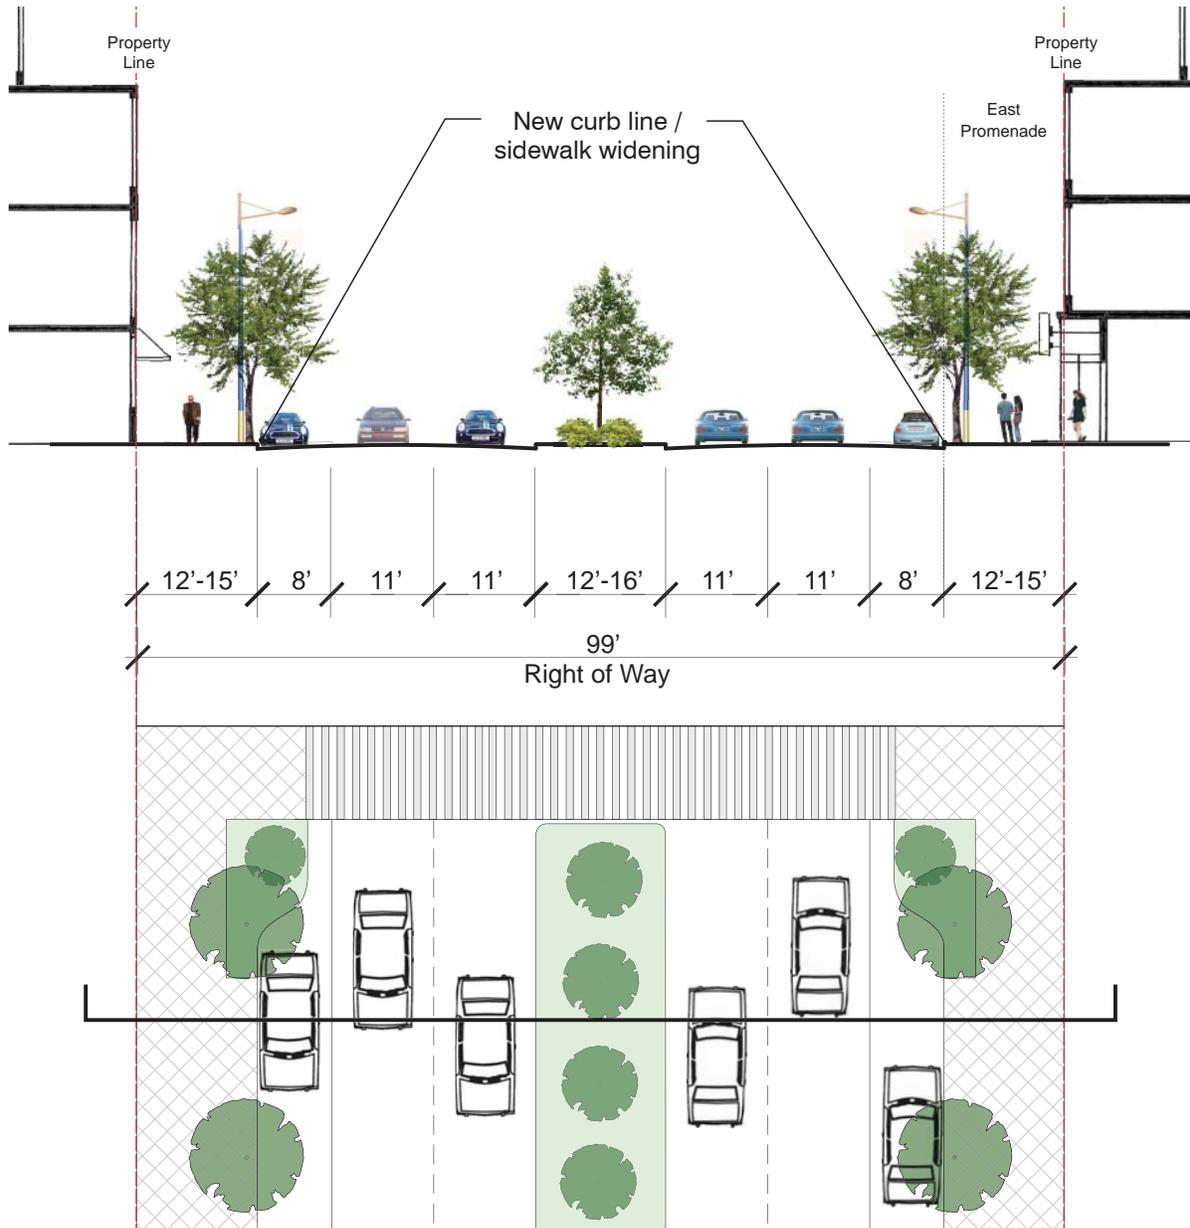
Typical section/plan at El Camino Real Downtown between Oak Grove Avenue and Menlo Avenue. Section/plan shows the interplay between parking, sidewalk (the sidewalk curves outward to create a parking bay) and crosswalk.
